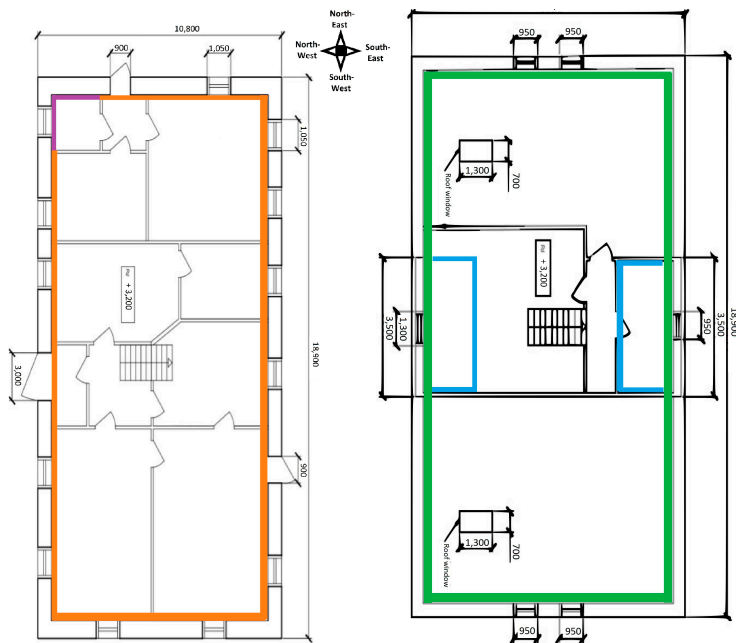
Location of four wall construction types in zones A2 after renovation in 2015, on the left 1st floor, on the right 2nd floor: type 1 (purple), type 2 (orange), type 3 (green), and type 4 (blue).
